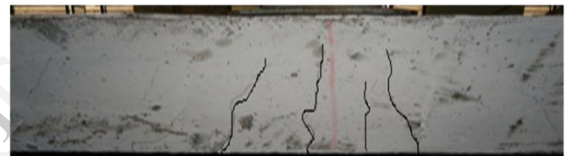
Beam - Wsb2 (Single layered welded wire mesh with brick core)
